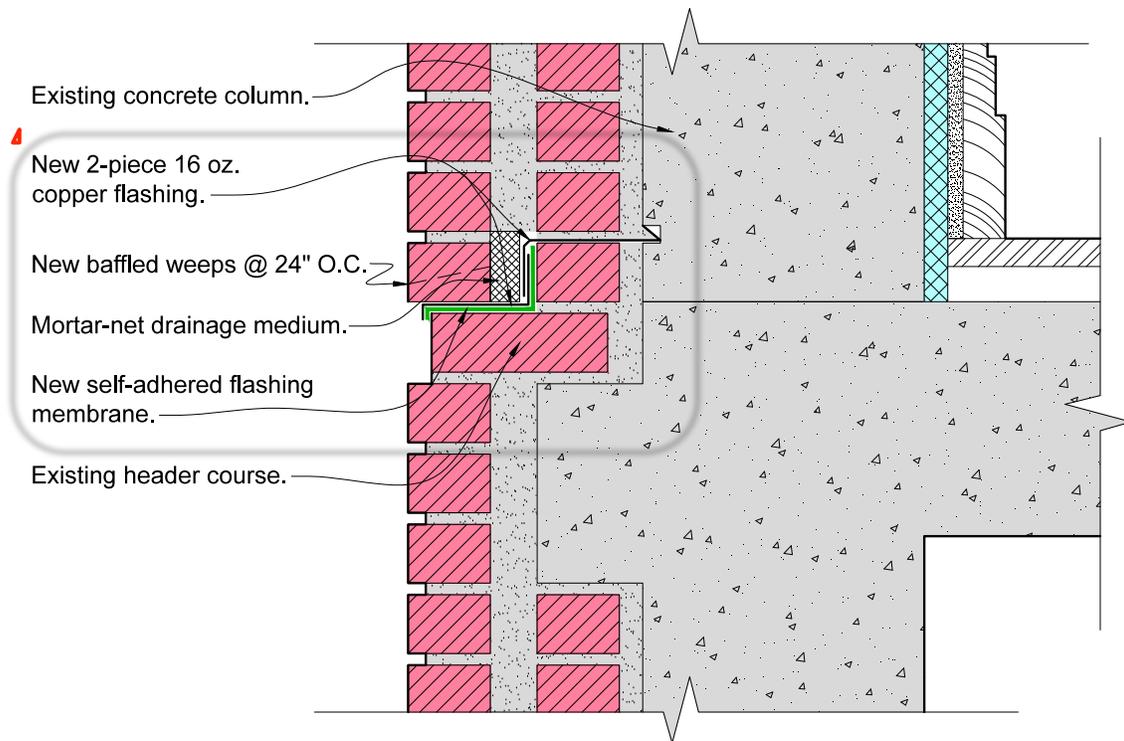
(5): Through-Wall Flash'gs. @ Lvl. 3 & 4 Slab Edges Abv. Portico Roof
